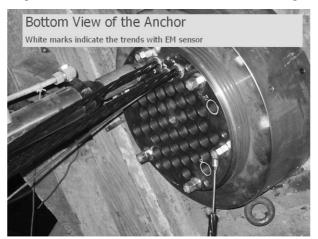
Bottom view of the anchor in Penobscot River Bridge
